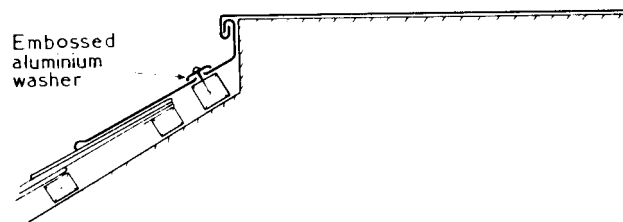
Aluminium roof discharging on to slated or tiled roof
